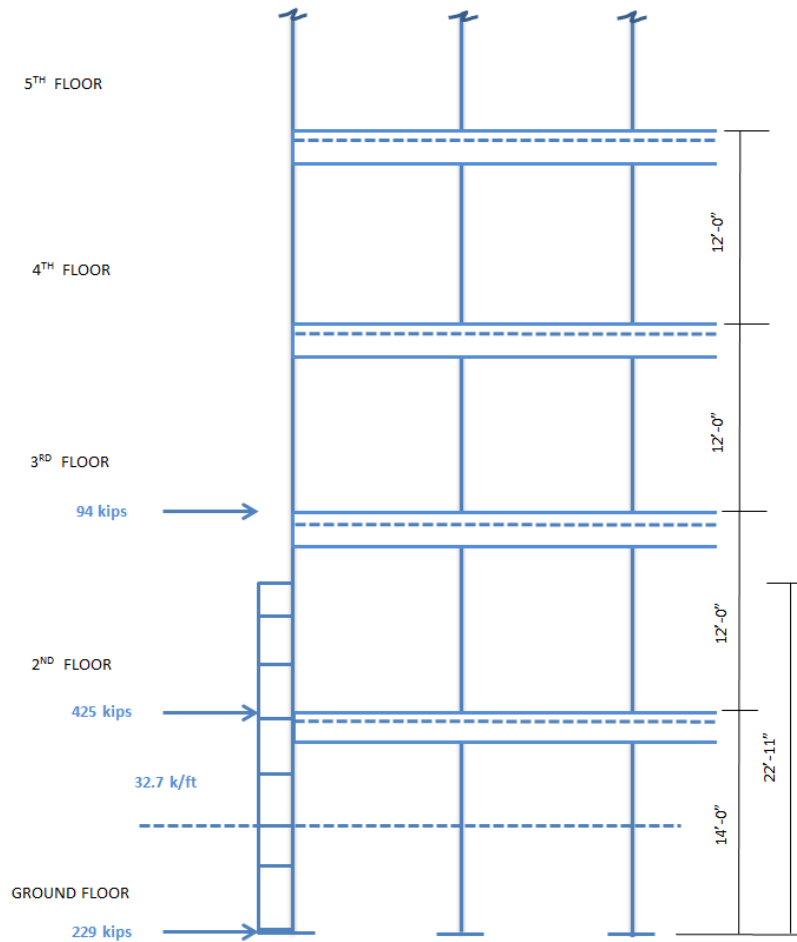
LC3 Tsunami loads on overall Waikiki office building
